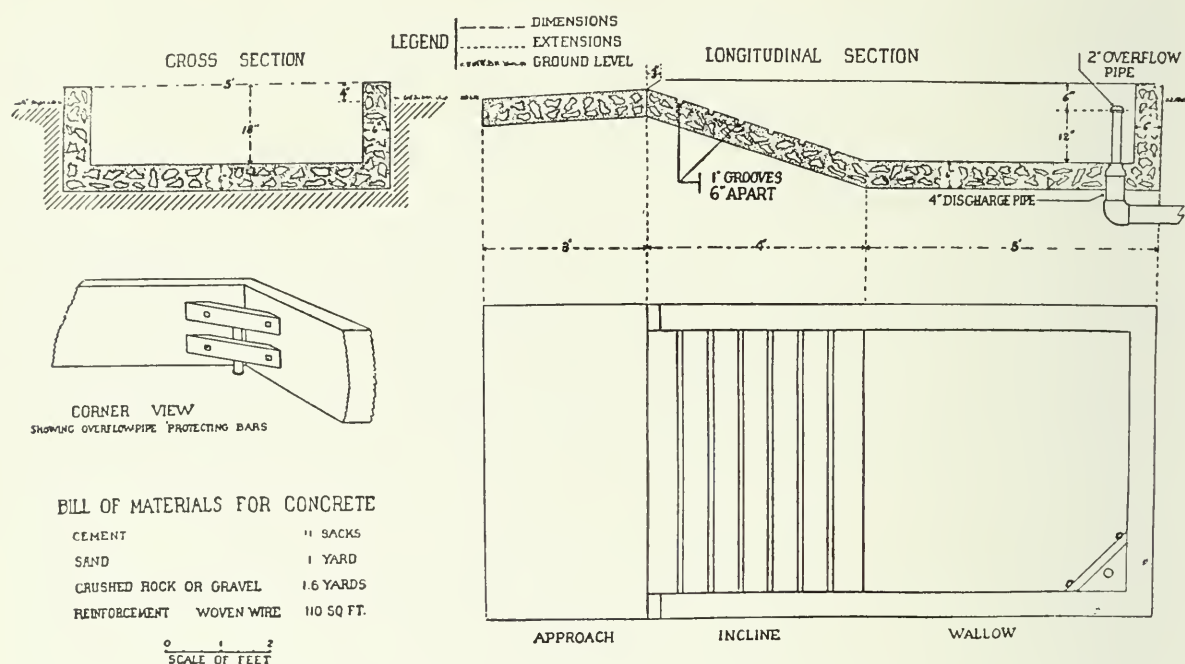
Plan of hog wallow—concrete construction (after Imes).
